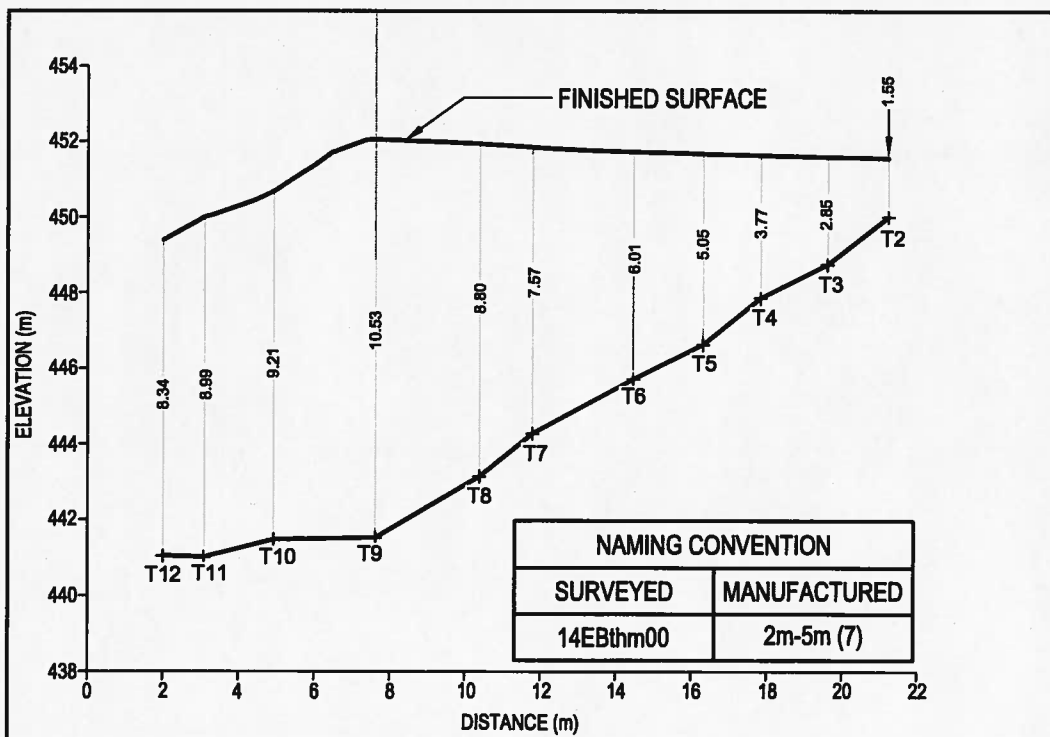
14EBthm00 (2m-5m (7)) - AS MANUFACTURED, PLAN, AND SECTION
